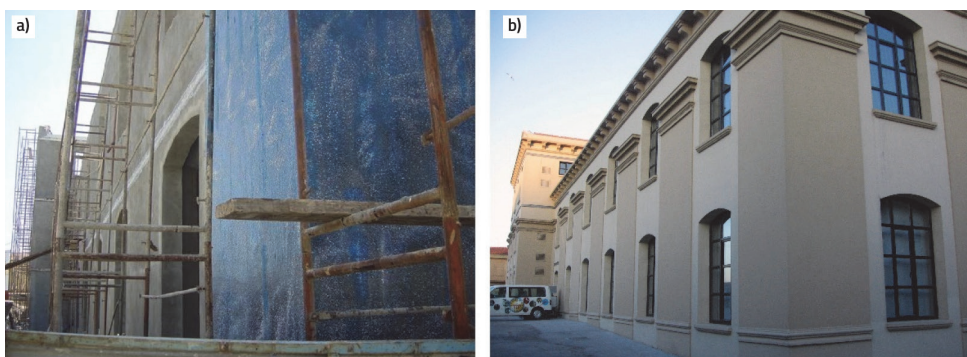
a) Retrofitting masonry walls with externally bonded CFRP fabrics; b) Final look of the building
